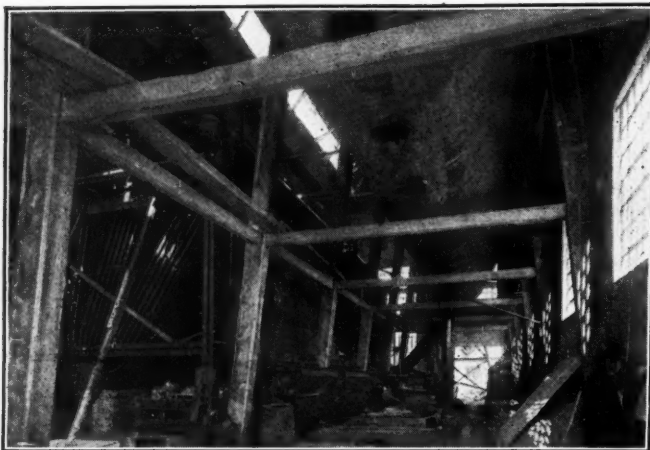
INTERIOR OF BOILER HOUSE, SHOWING CONCRETE COAL BUNKERS
